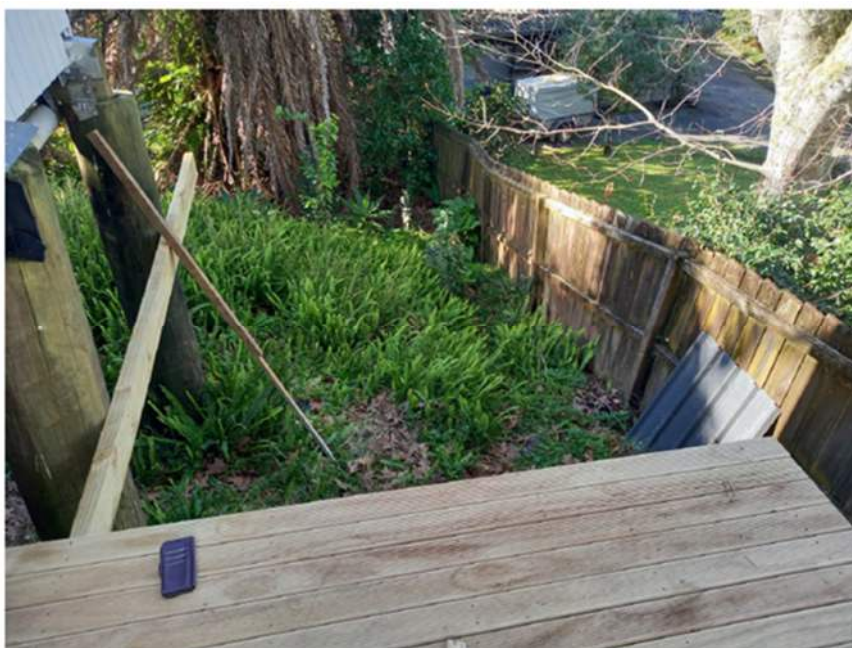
Photograph of the sloping ground adjacent to the deck (taken by the authority on 13 August 2025, prior to the construction of the barrier).
